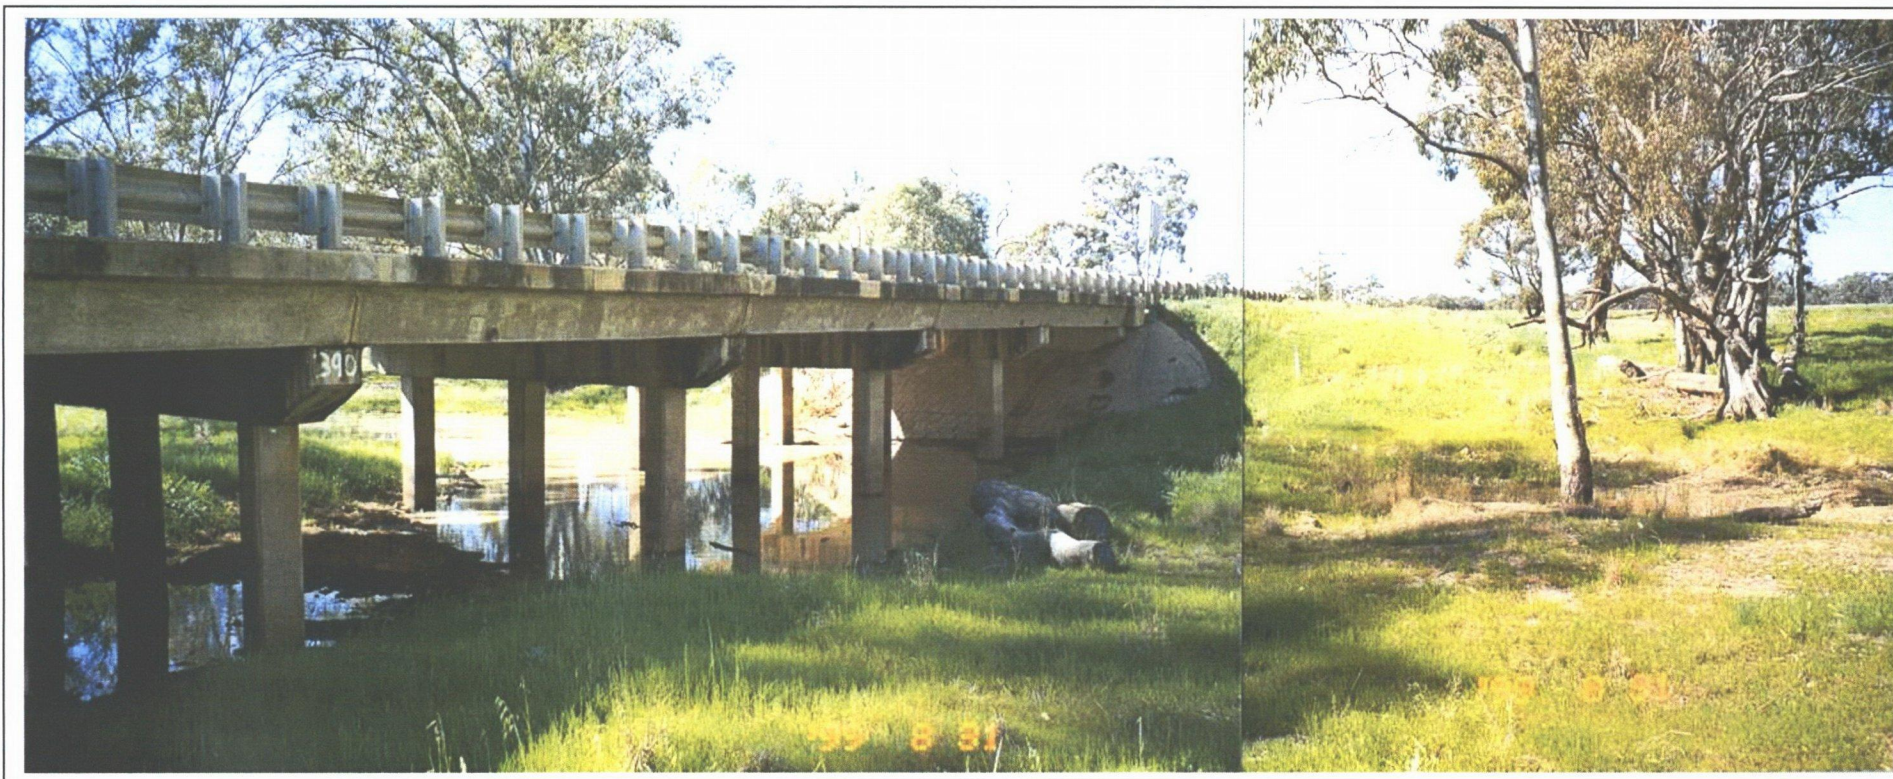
Gum Creek Bridge looking east from north west side of the bridge.
